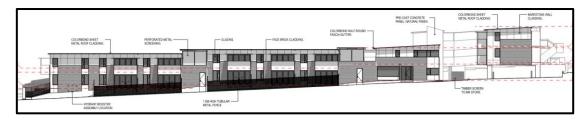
A view of the western elevation that is to be viewed from the frontage of the site.
